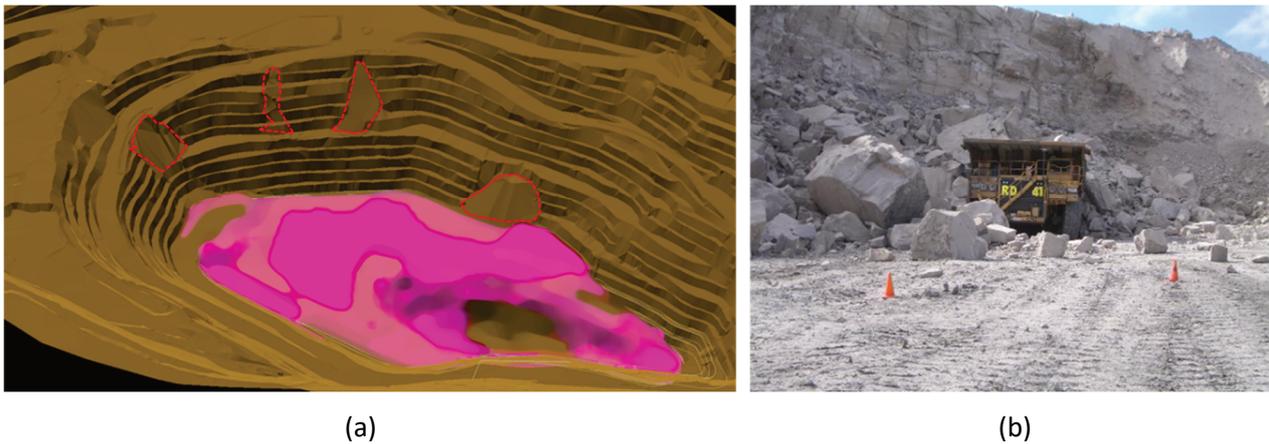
(a) Inter-ramp scale instabilities potentially affecting future developments of the extraction plan; (b) Accident at the bench level affecting people and equipment
